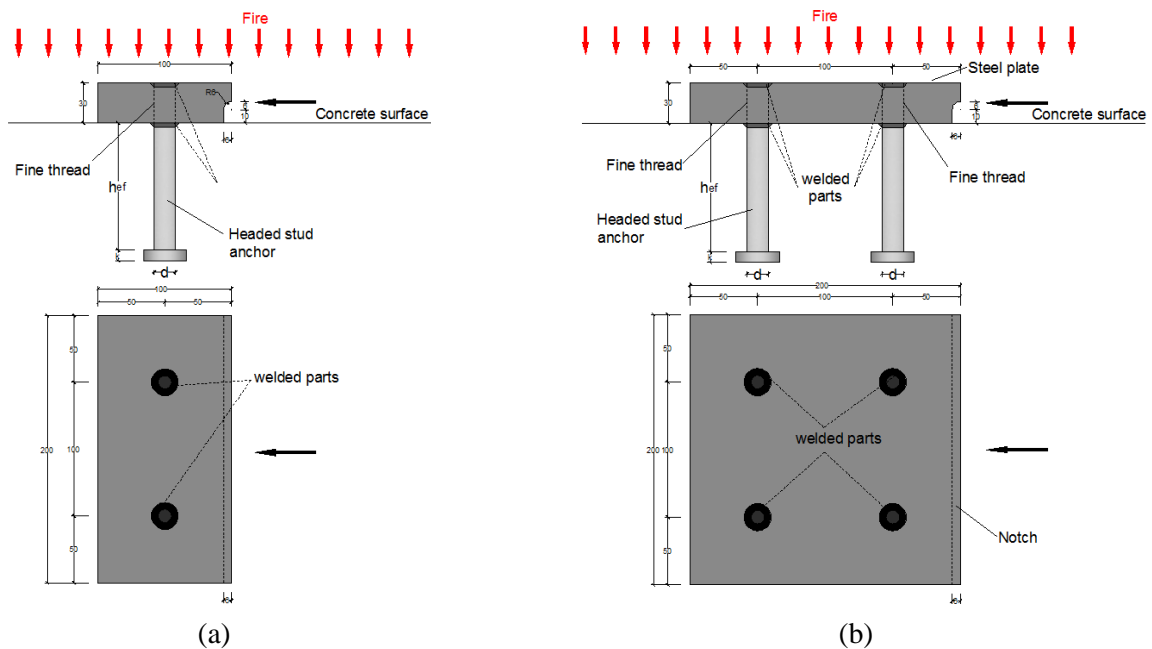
Sketch of anchor groups for pry-out failure tests: (a) two-stud anchor group G2-h85d25; (b) four-stud anchor group G4-h85d25.
